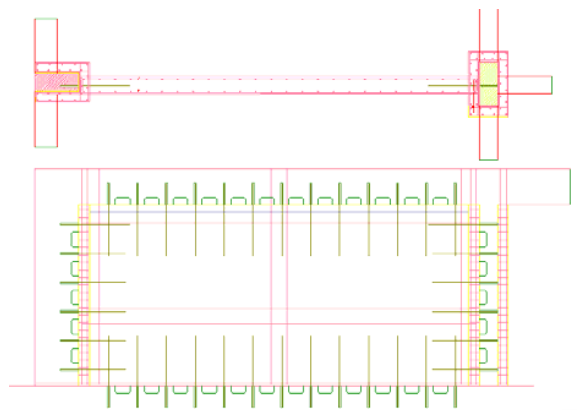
Typical shear wall-frame connection anchorage details and section in project
